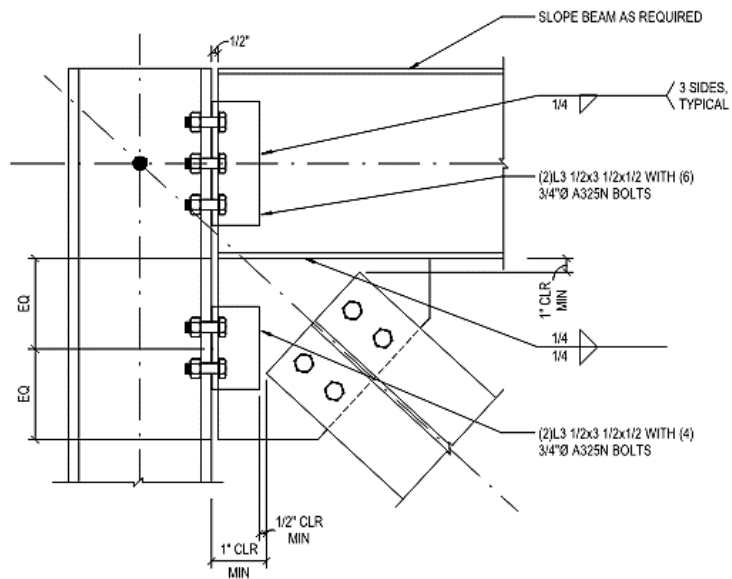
Vertical Brace Connection: Gusset Shop-Welded to Beam
